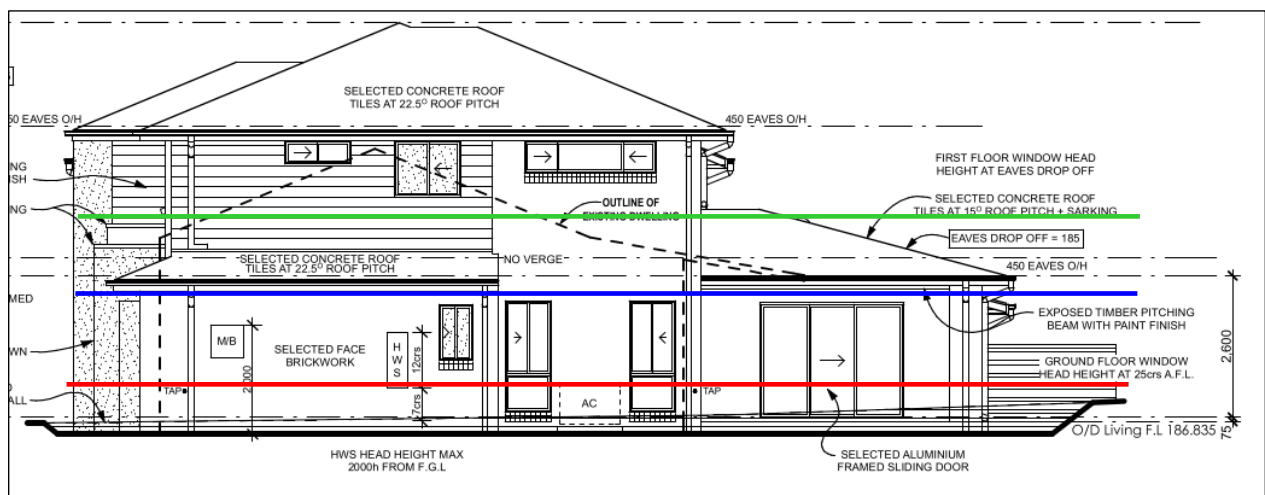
Southern elevation of existing dual occupancy adjoining site to the north
